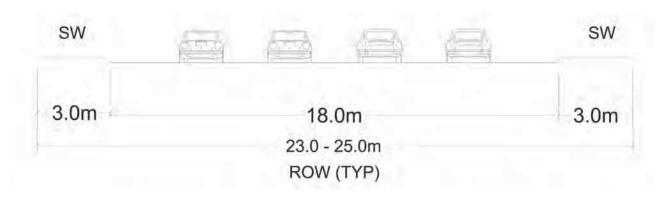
Schematic Parliament Street Cross-Section (facing north)
